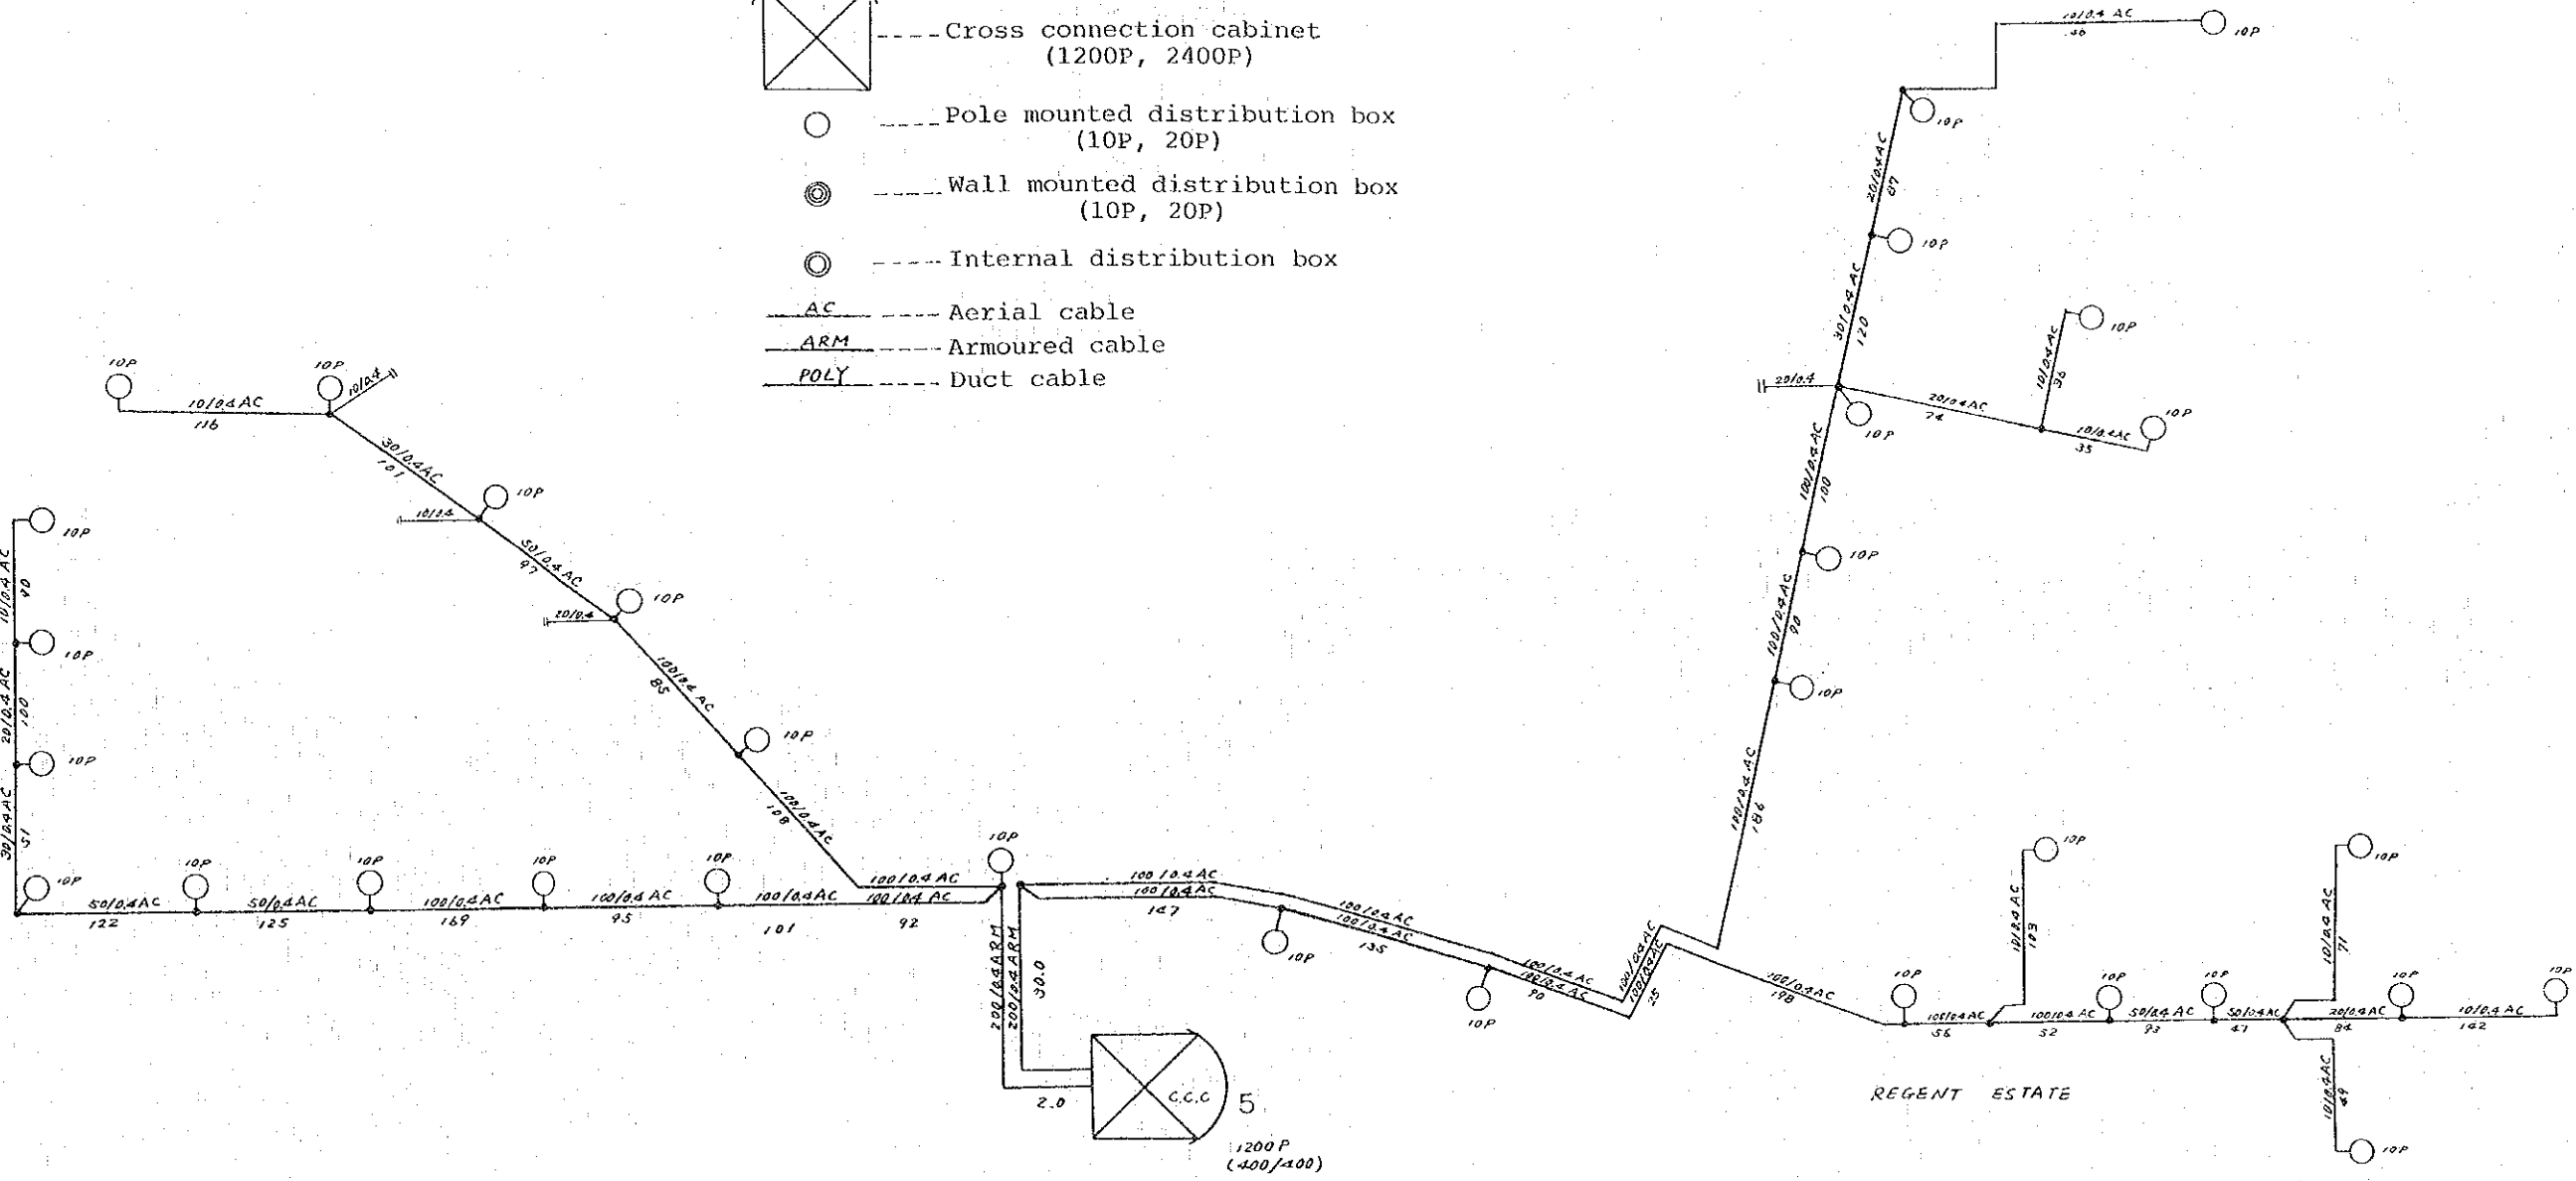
Secondary cable plan in Oyster Bay Exchange Area (6/9)
